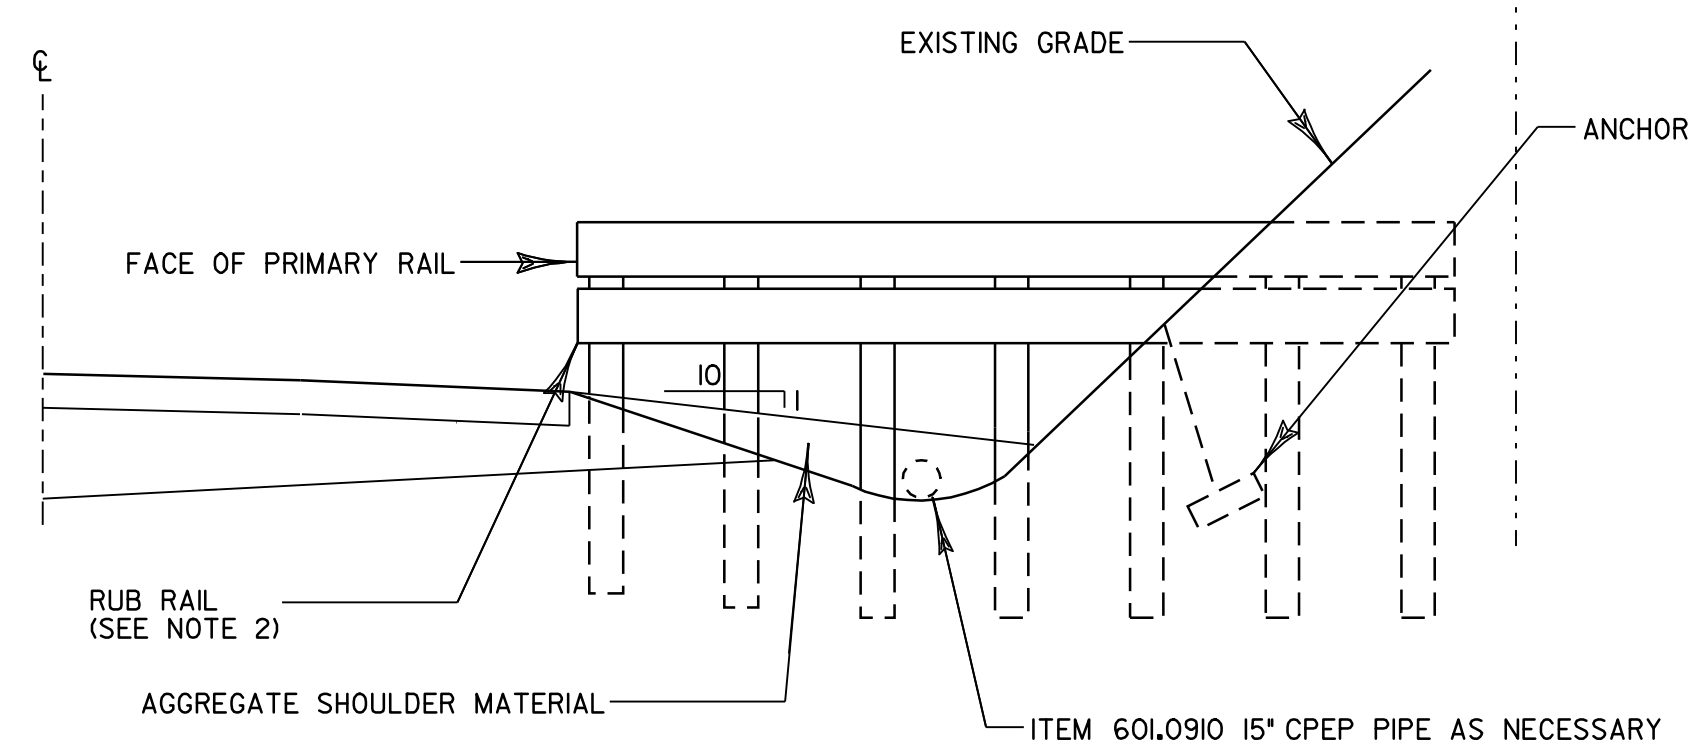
DETAIL FOR BURIED GUARDRAIL ENDS INTO BACKSLOPE WITH RUBRAIL
